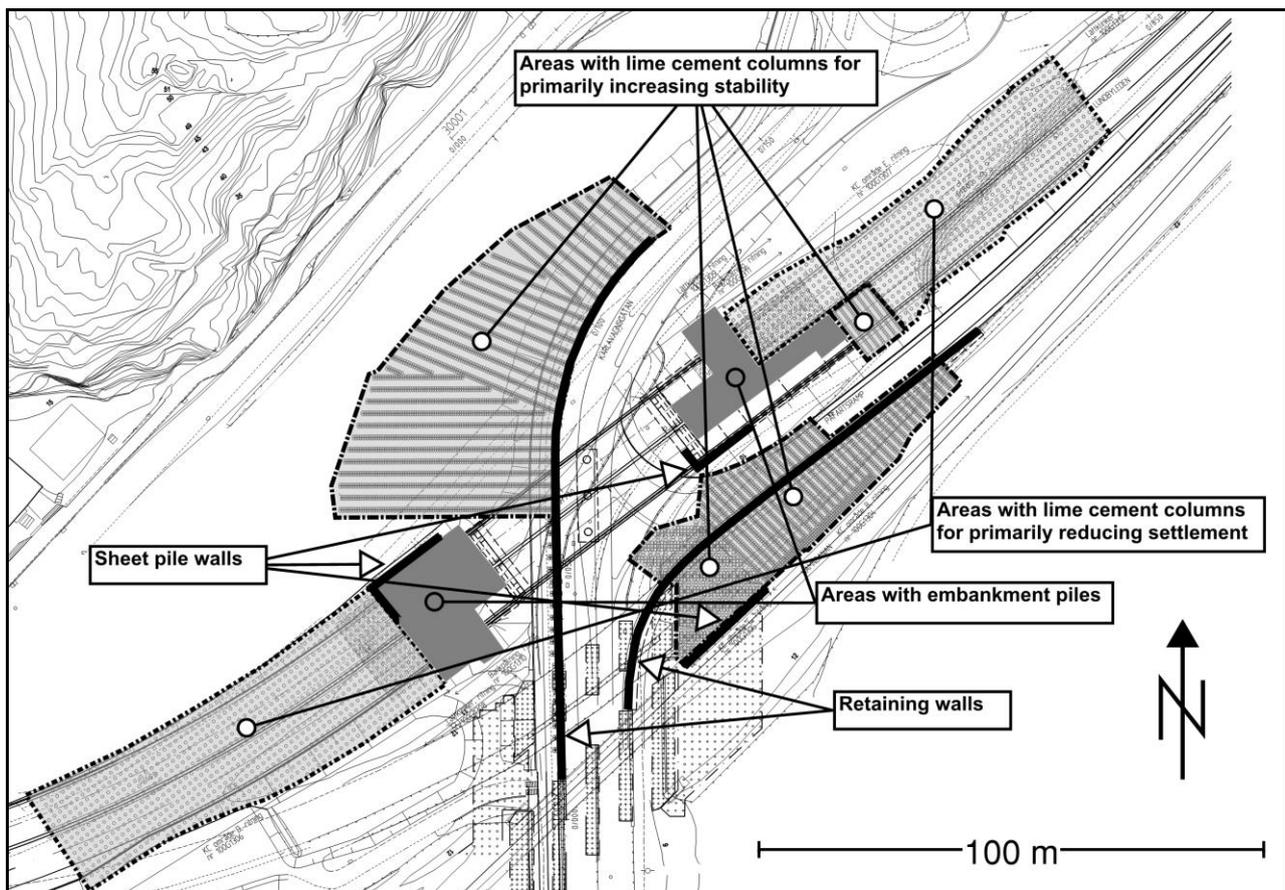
Plan drawing showing the major geotechnical measures (lime cement columns, embankment piles, retaining walls and sheet pile walls) that were required according to the Contract Documents.
